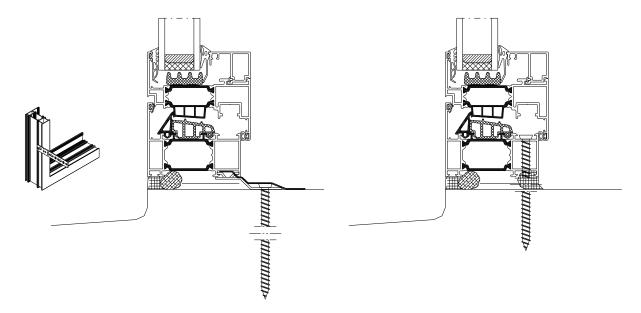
C Mounting plate on the sill/ doorstep or direct screwing through the frame
